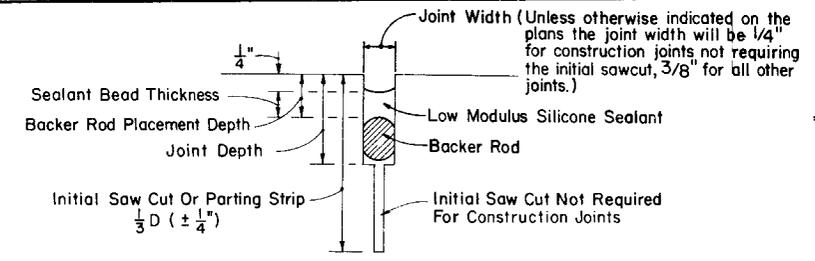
DETAIL OF LONGITUDINAL CONSTRUCTION JOINT
